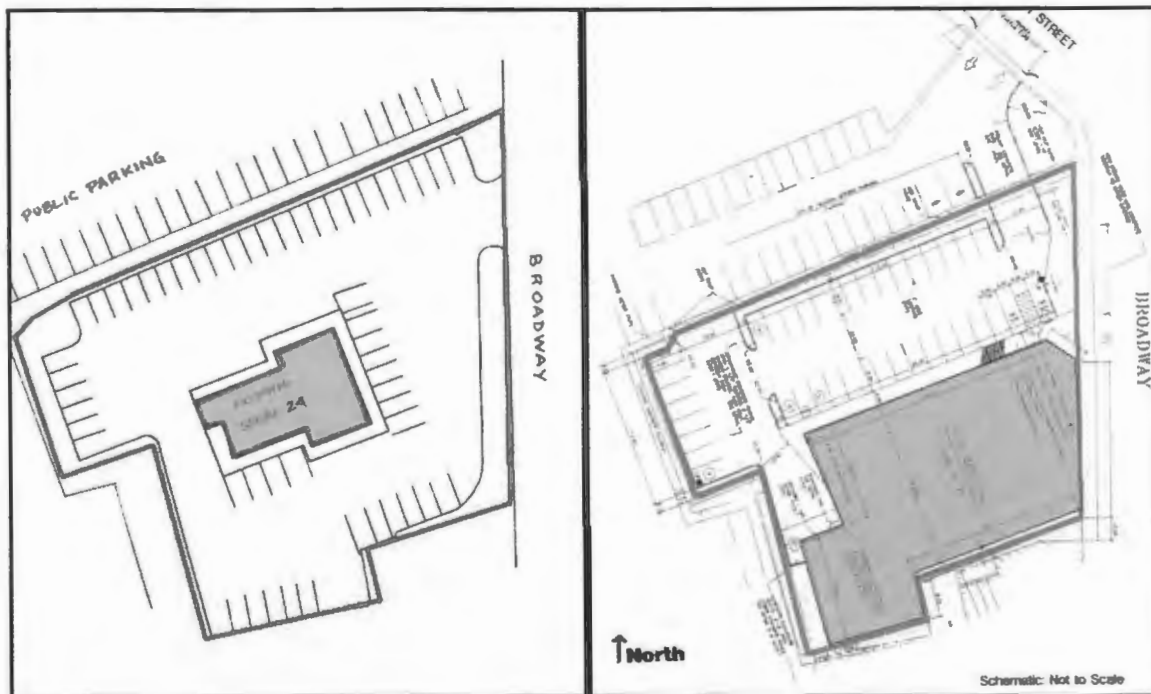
Former site layout of Store 24 and Walgreens reconfigured site plan for the same lot. 40 Broadway, Taunton, Massachusetts. Courtesy of Abend Associates.
